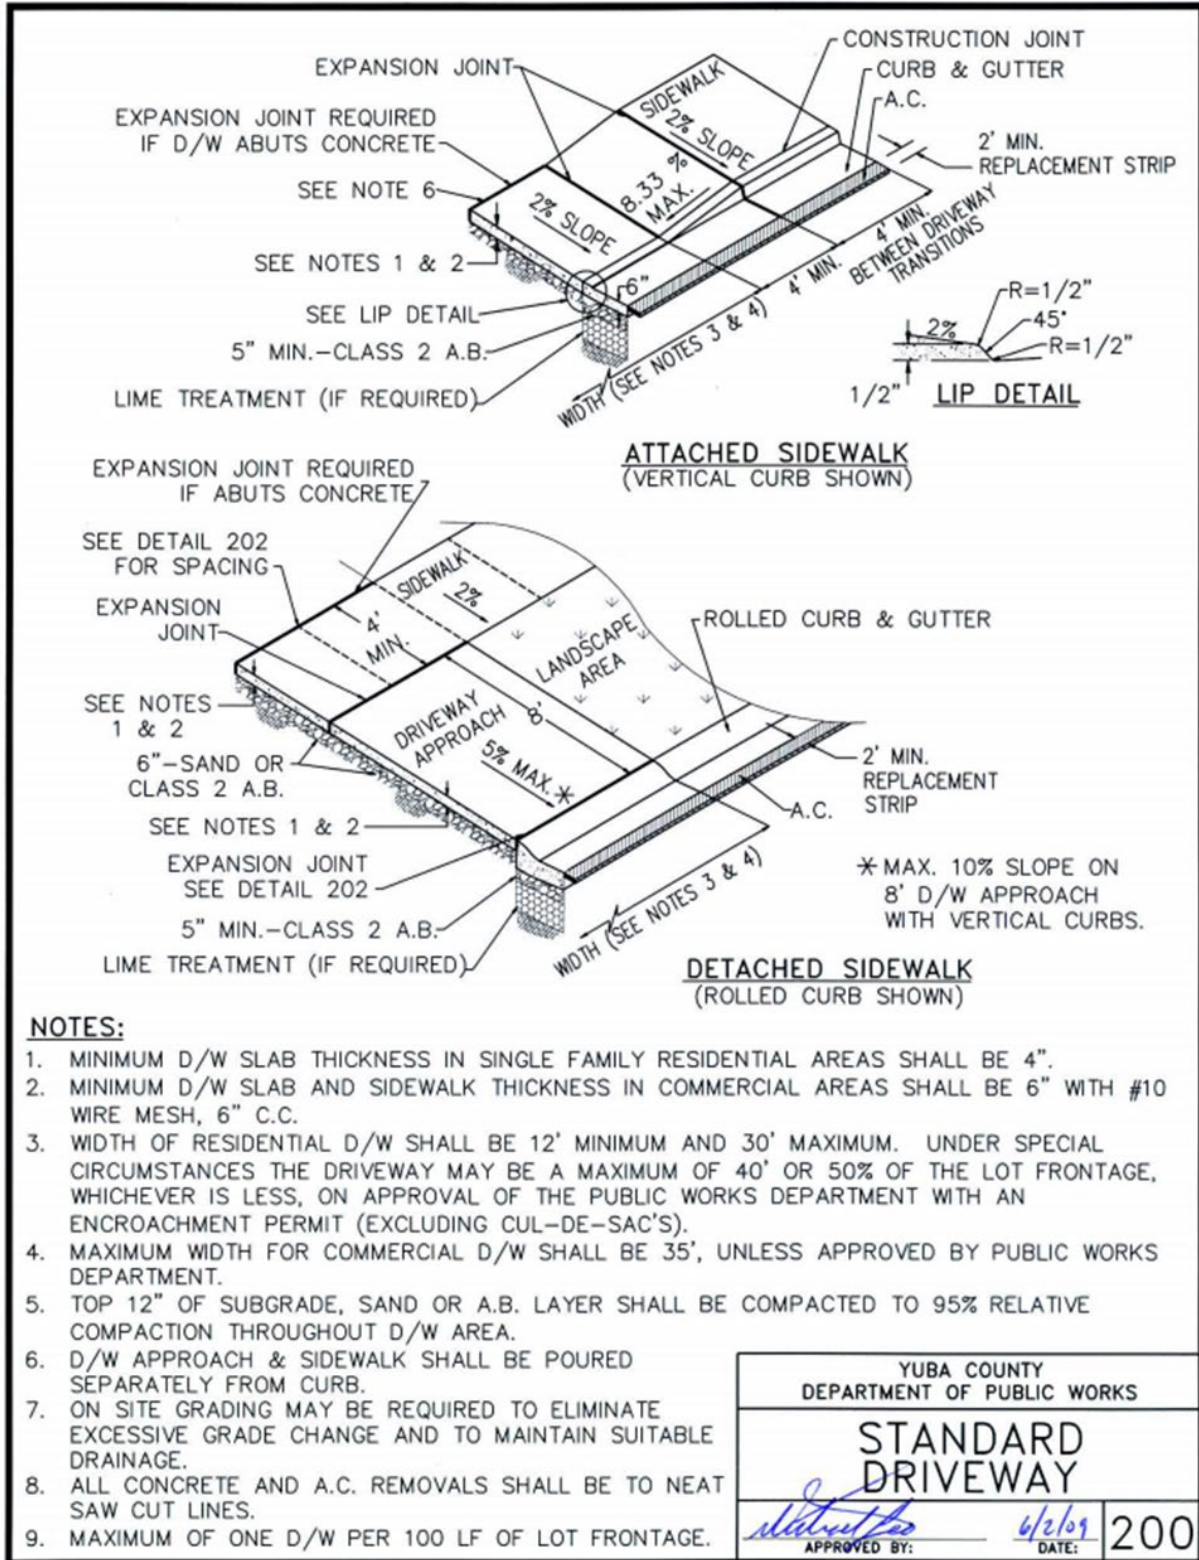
Yuba County Department of Public Works Standard Driveway Drawings
